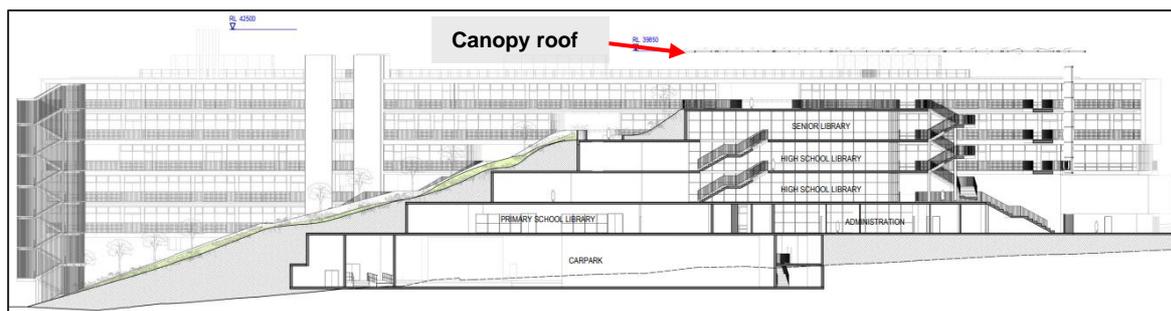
Canopy roof as originally approved (Source: Department's original Assessment Report 2020)
